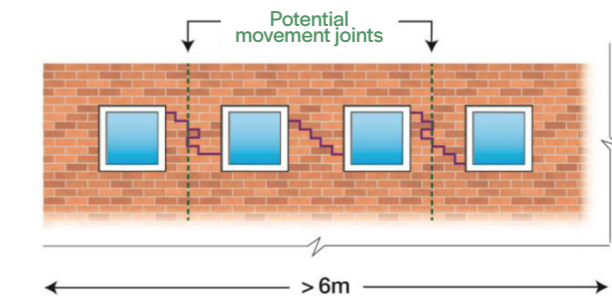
Long runs of uninterrupted brickwork, especially when vertical loading is low, can lead to diagonal cracking of narrow brickwork panels between window openings.
